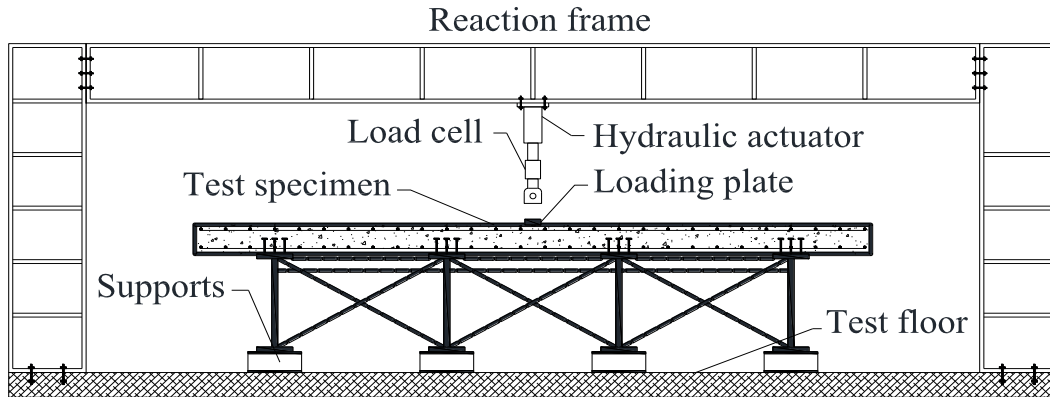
Typical loading system for the bridge deck under a concentrated load (adapted from Youn and Chang 1998)
